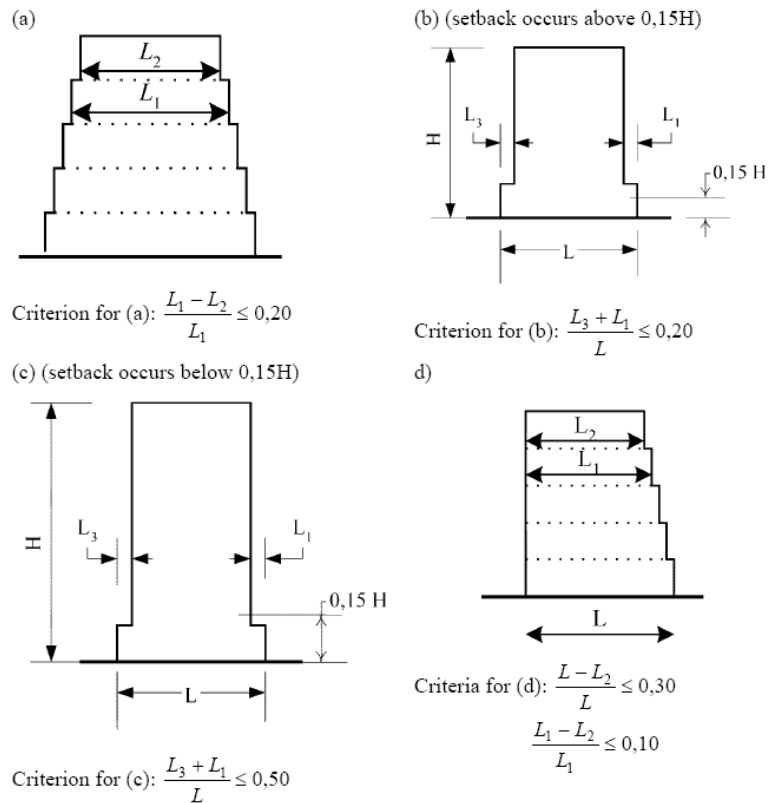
Criteria of regularity in elevation for buildings with setbacks (EC8 §4.2.3.3)
